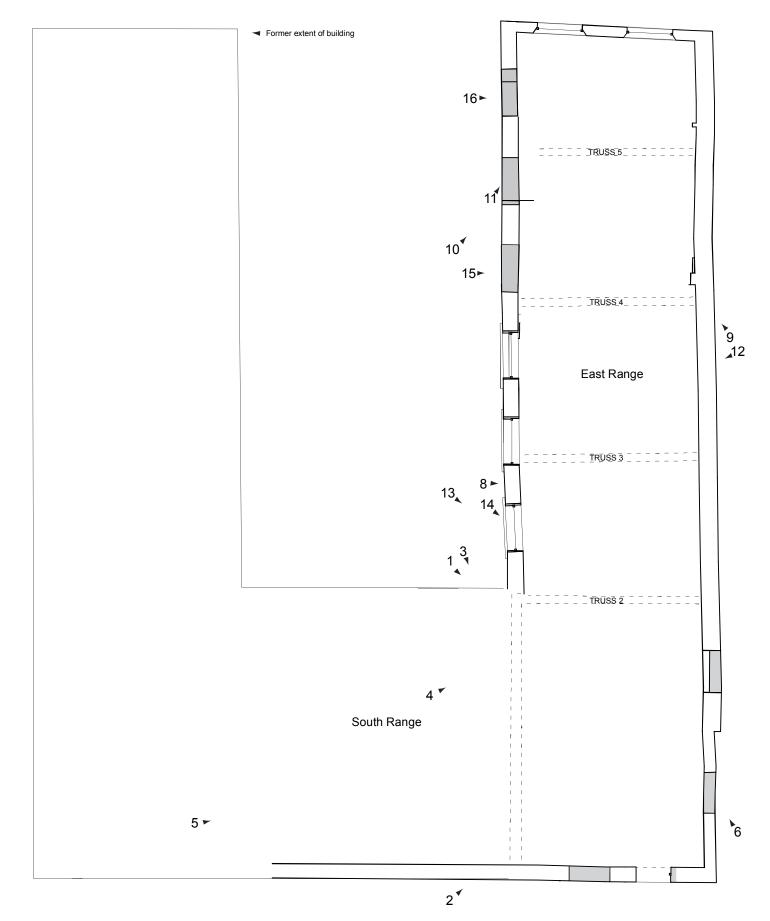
Plan of the First White Cloth Hall showing the location of roof trusses and photo directions
